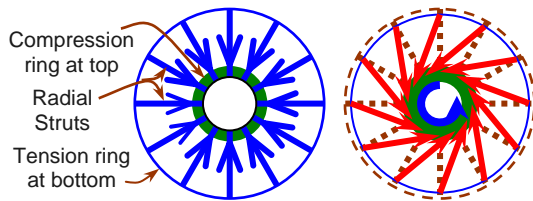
(Left) As designed, (Right) As deformed, causing collapse
